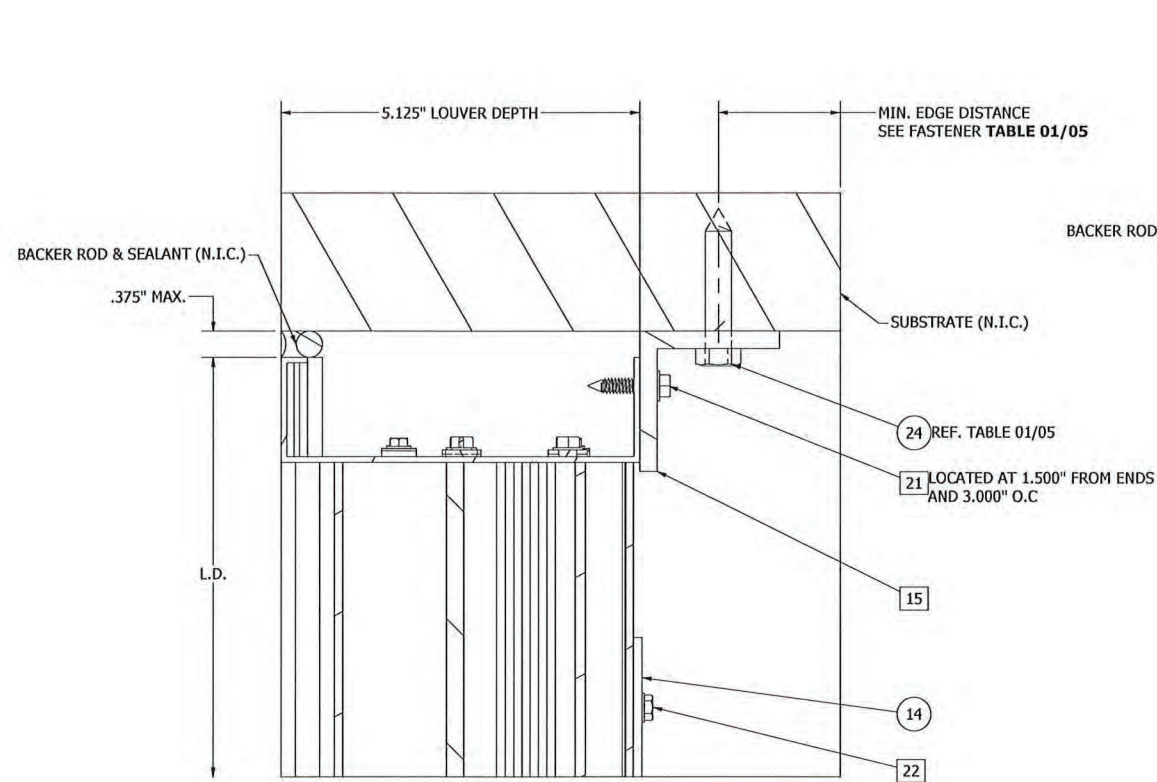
(STANDARD ANGLE INSTALLATION)
